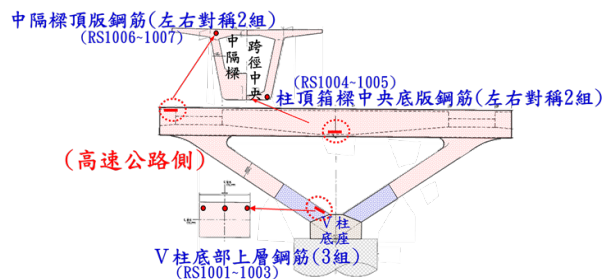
The displacement monitoring allocation of V-type pier and box girder on columns' top
